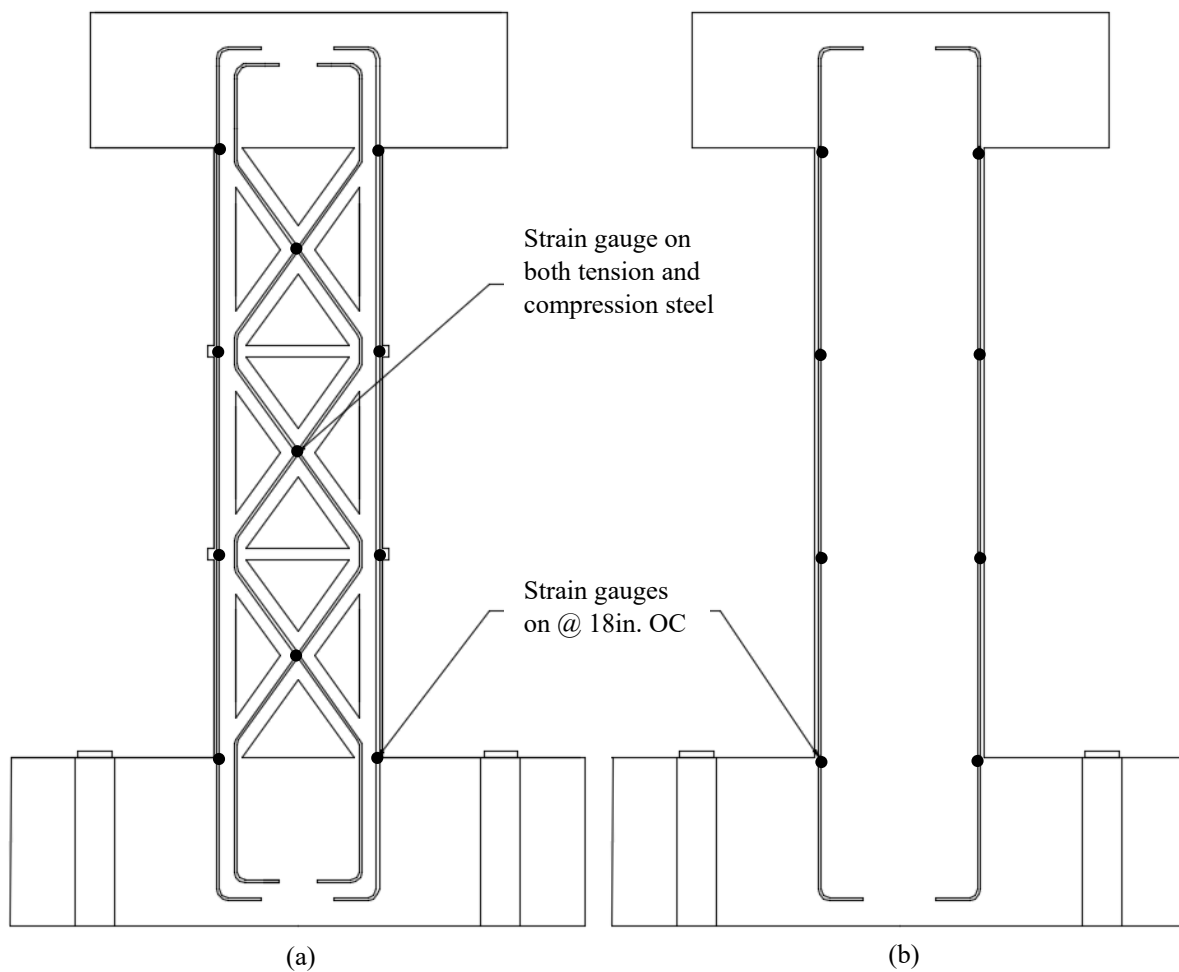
Strain gauge locations in (a) optimized and (b) control wall specimens (only the instrumented reinforcement is shown for clarity)
